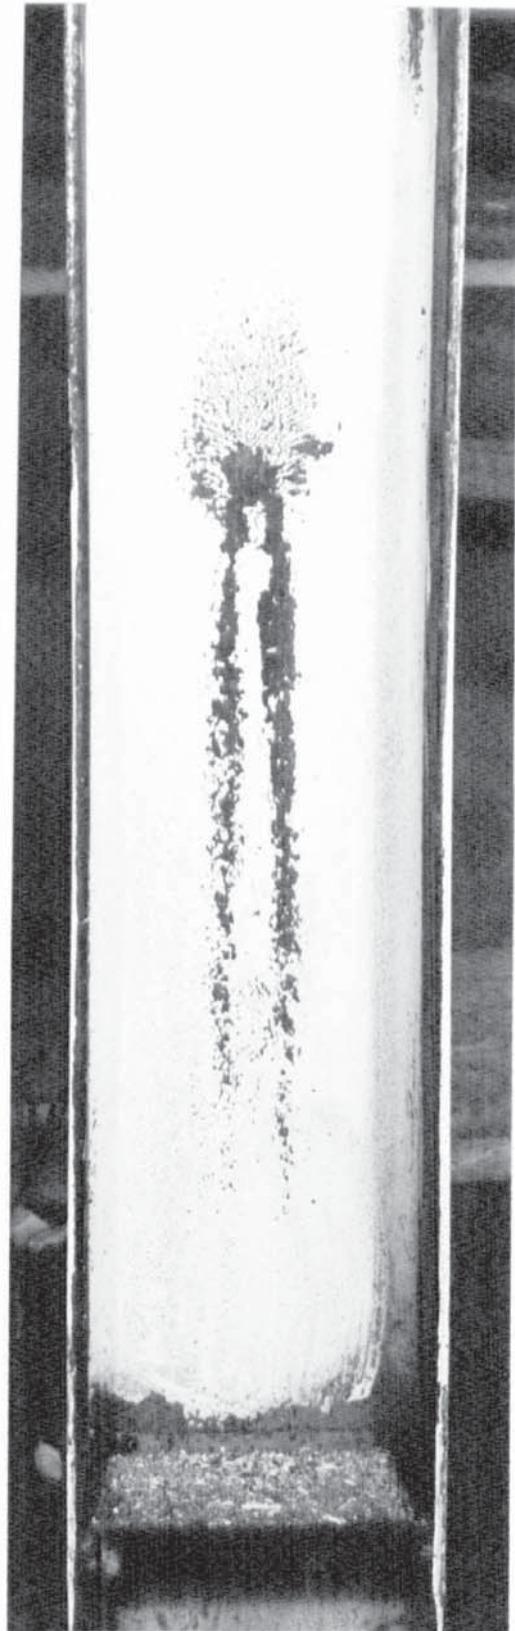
Secondary beam-to-column connection with stiffener in the beam compression region showing yield lines on the column web at ultimate load.
